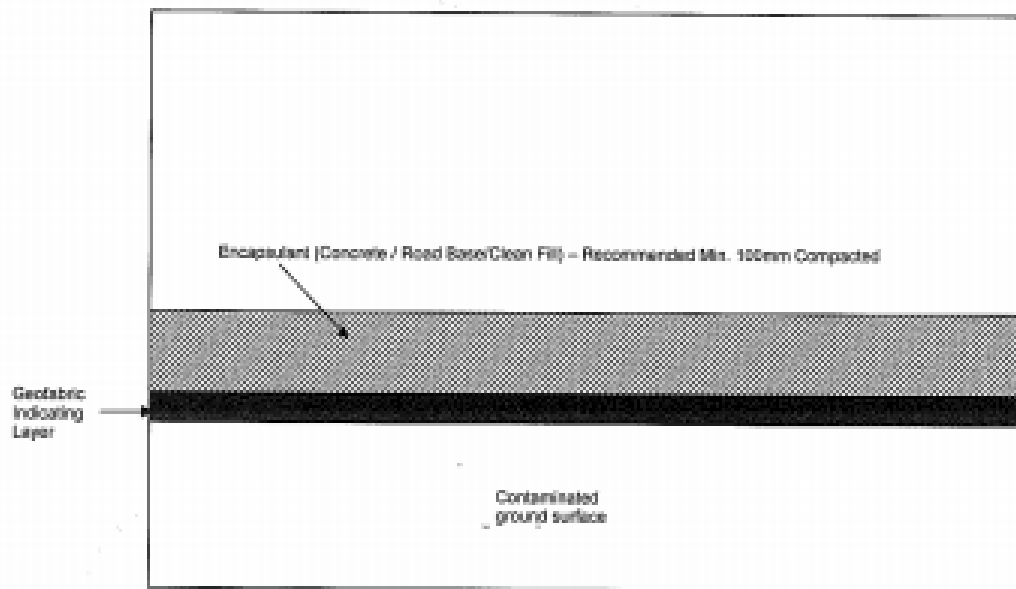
Typical Profile of Capping Layer – Areas 16 (Switchyard) 17, 18, 22
